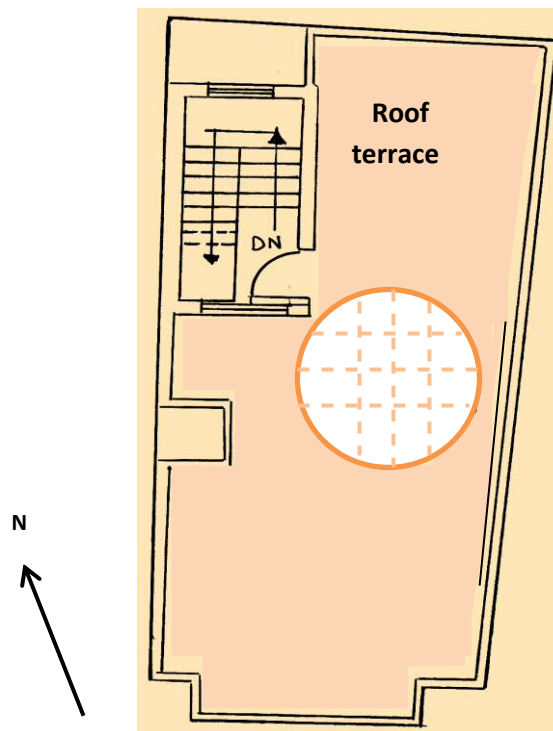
Roof terrace level plan of the modern house No. 6. Scale: 1:100
